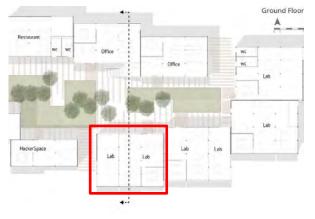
Site plan of the office building. Source: Atoyle Architects.
